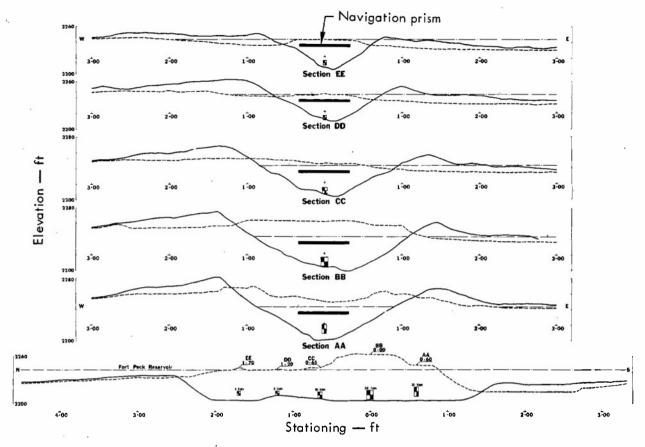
Cross sections and longitudinal profile through Pre-Gondola III, Phase III reservoir connection.
